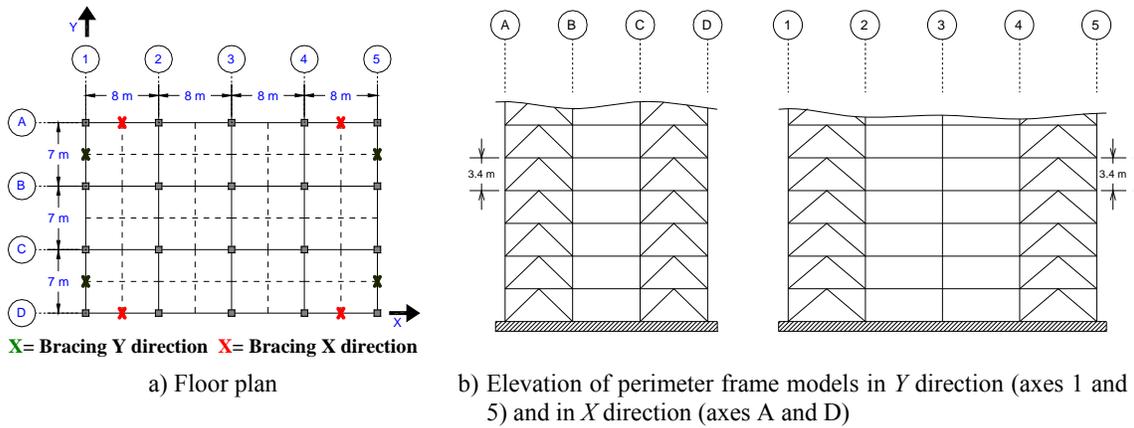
Floor plan and elevation view of the studied frames for T1 buildings
